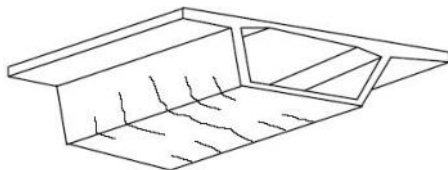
Box Girder Cracks Induced by Flexure (Positive Moment)
